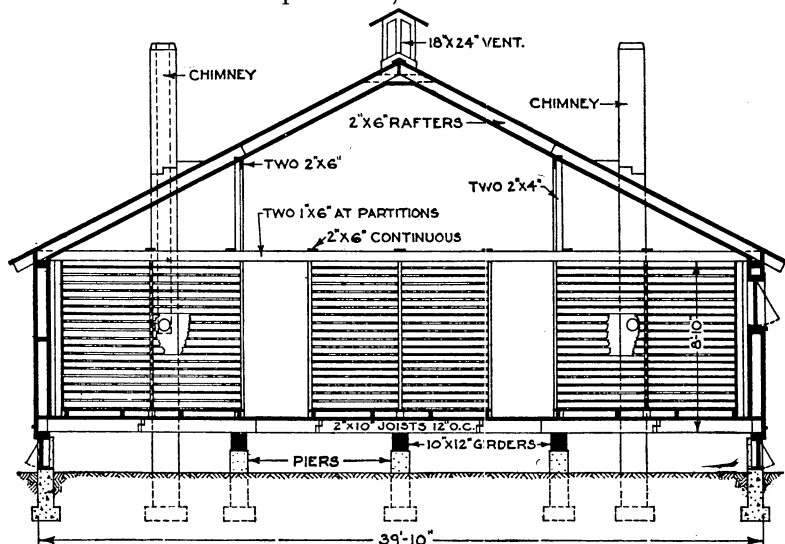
Cross section of a sweet potato storage house, size 39 feet 10 inches by 100 feet 10 inches, having a capacity of 12,000 bushels in crates or 15,000 bushels in bulk, showing the arrangement of bins and other structural details. If the sweet potatoes are to be stored in crates, the height should be changed to 11 feet 4 inches for the same capacity. If the house is used for bin storage, the sweet potatoes should be loaded not over 6 feet high.
